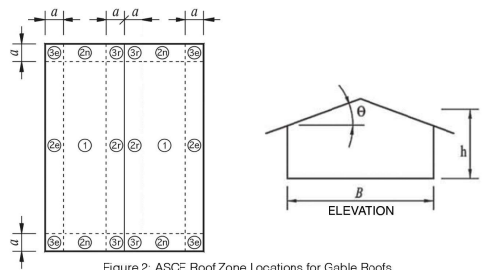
ASCE Roof Zone Locations for Gable Roofs
